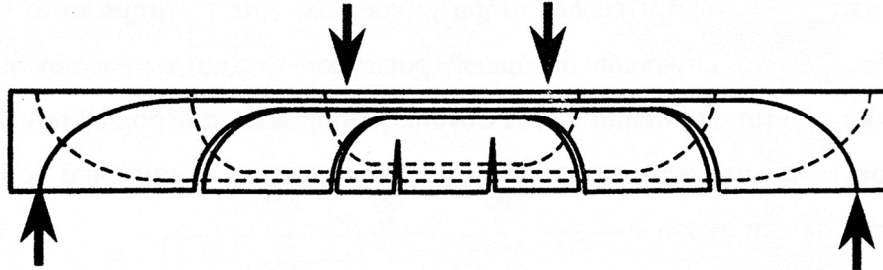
Cracks developed in a simply supported concrete beam (image: Kotsovos, M.D. [31])
